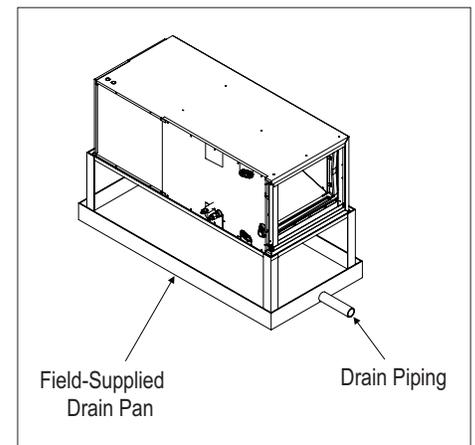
Typical Horizontal Left/Right Installation Drain System.
